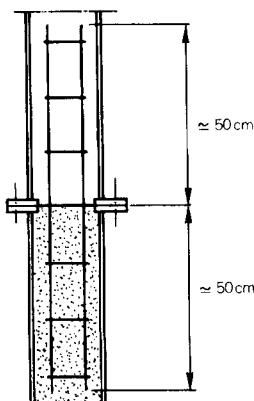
Inserting light reinforcement through the connection between two column sections
